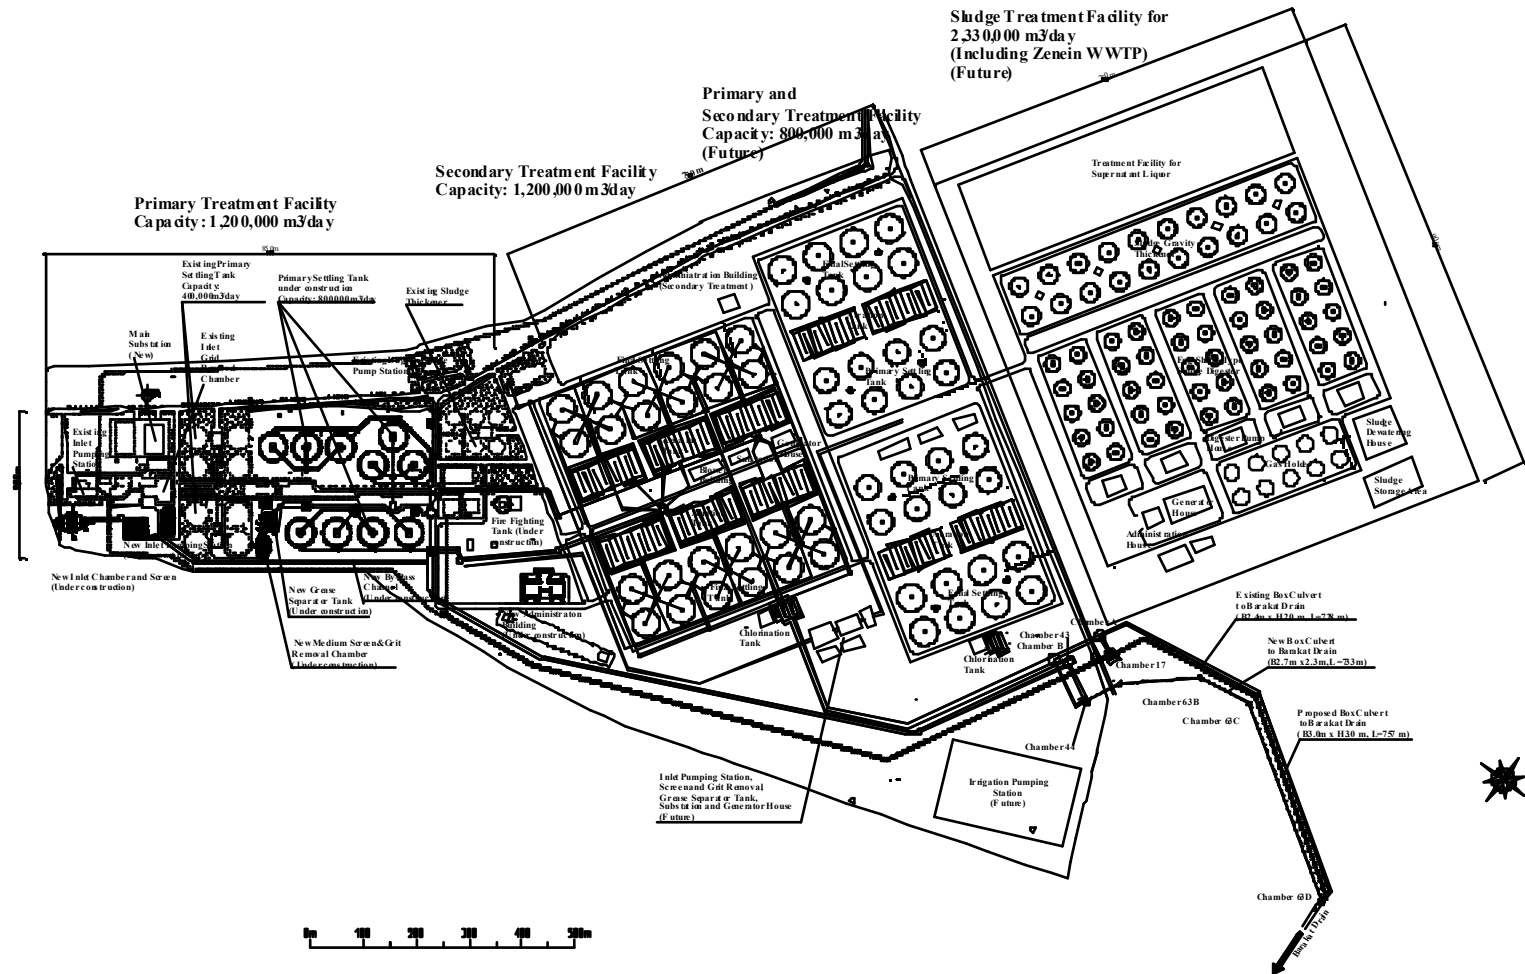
Existing and Proposed Wastewater Treatment Facilities at Abu Rawash WWTP
